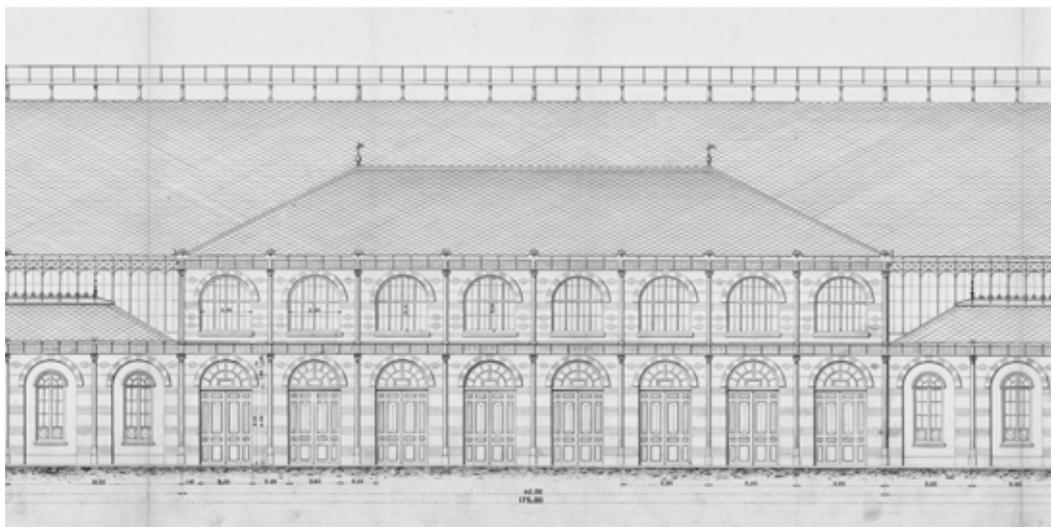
Detail of the north elevation. Delicias railway station, 2 Aug.1879. Author: Émile Cachelièvre. Archivo Historico ferroviario, Madrid
